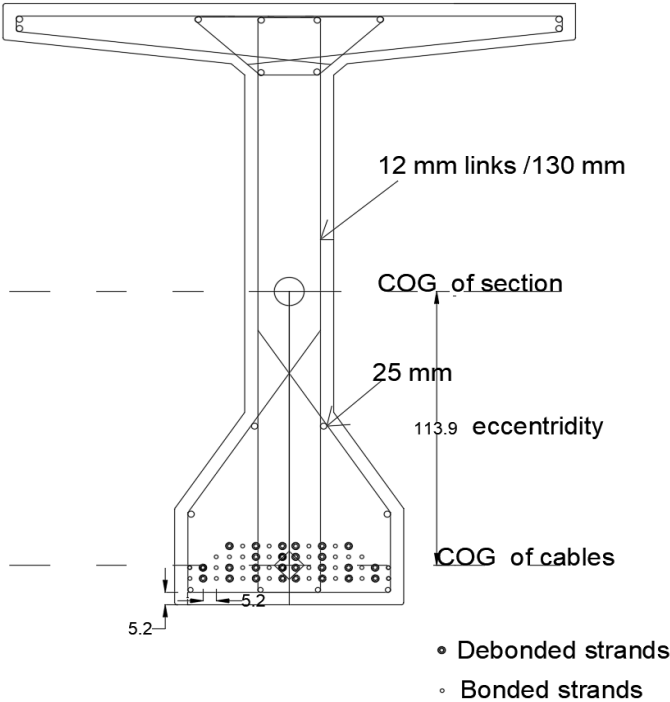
Detailed section for the precast beam at supports for the Eurocode design.
